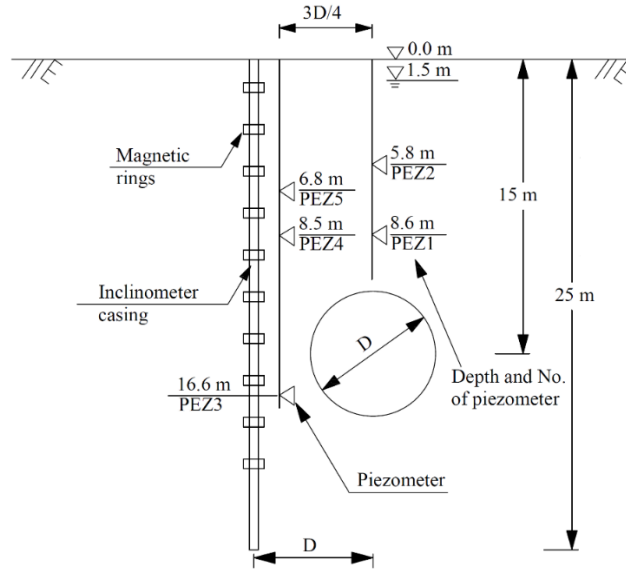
17: Layout of instrumentation with respect to the cross-section of the tunnel
